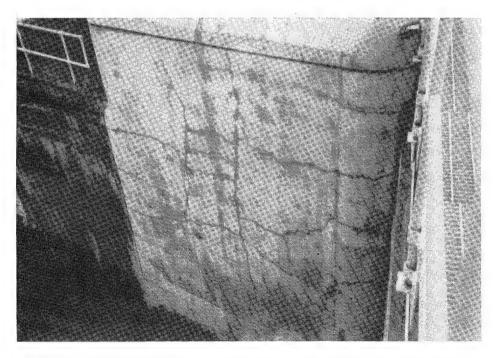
Typical cast-in-place concrete resurfacing of miter gate monoliths, Troy Lock (from Miles 1993)
